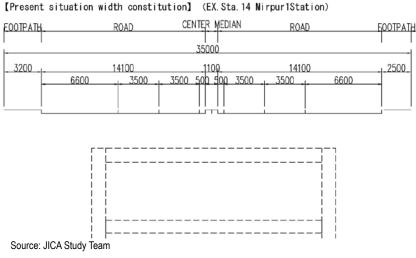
Current Road Width at Mirpur 14 Station
